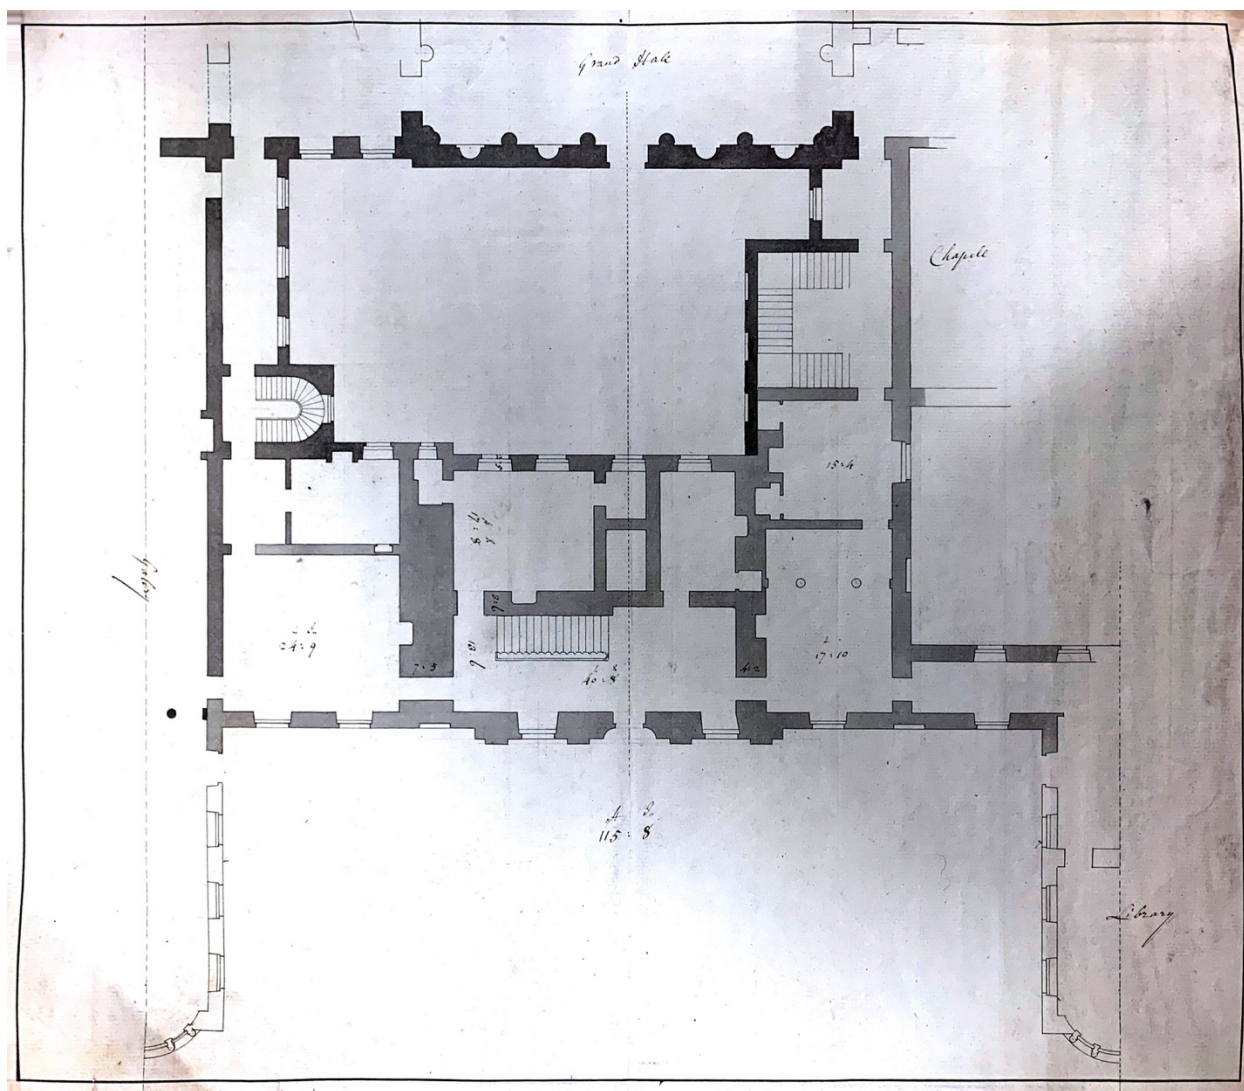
Plan of principal floor in Garden front showing alternative staircase plans, John Carr (?), n.d. WWM MP 5(a).
